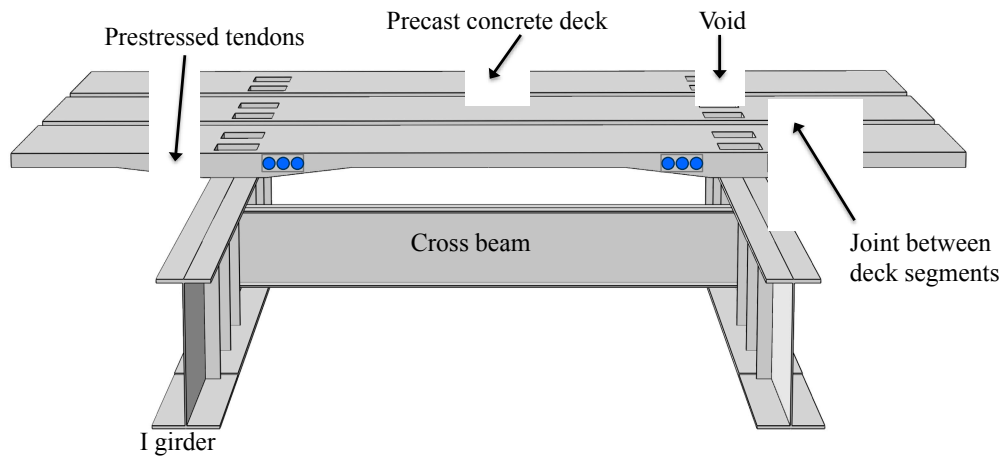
A continuous twin-I girder with prestressed precast concrete deck in the hogging region.
